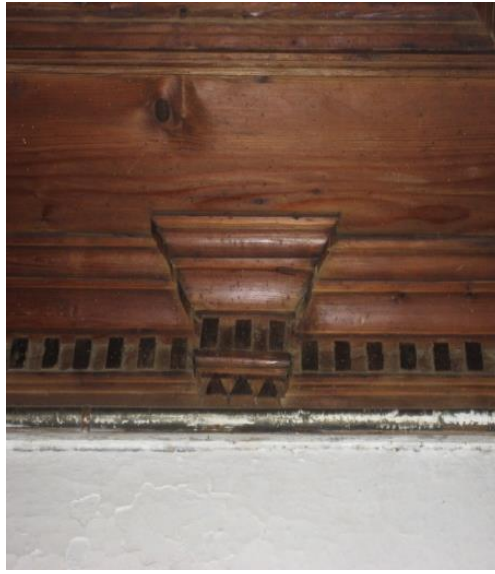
Cepneli Mehmet Bey house– Ceiling detail (P.A.)
